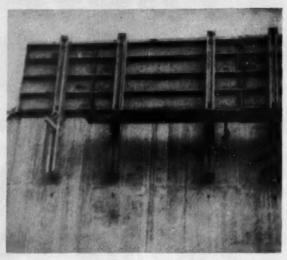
STEEL CANTILEVER FORMS developed by Blaw-Knox in common use for 5-ft lifts in mass concrete dam construction.
